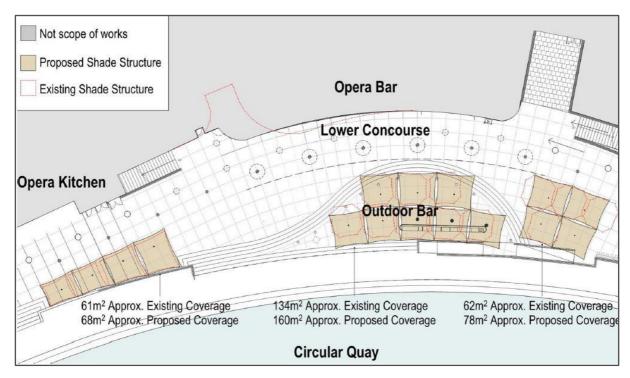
| Existing and Proposed Shade Structures (Source: Applicant's Architectural Design Statement)
